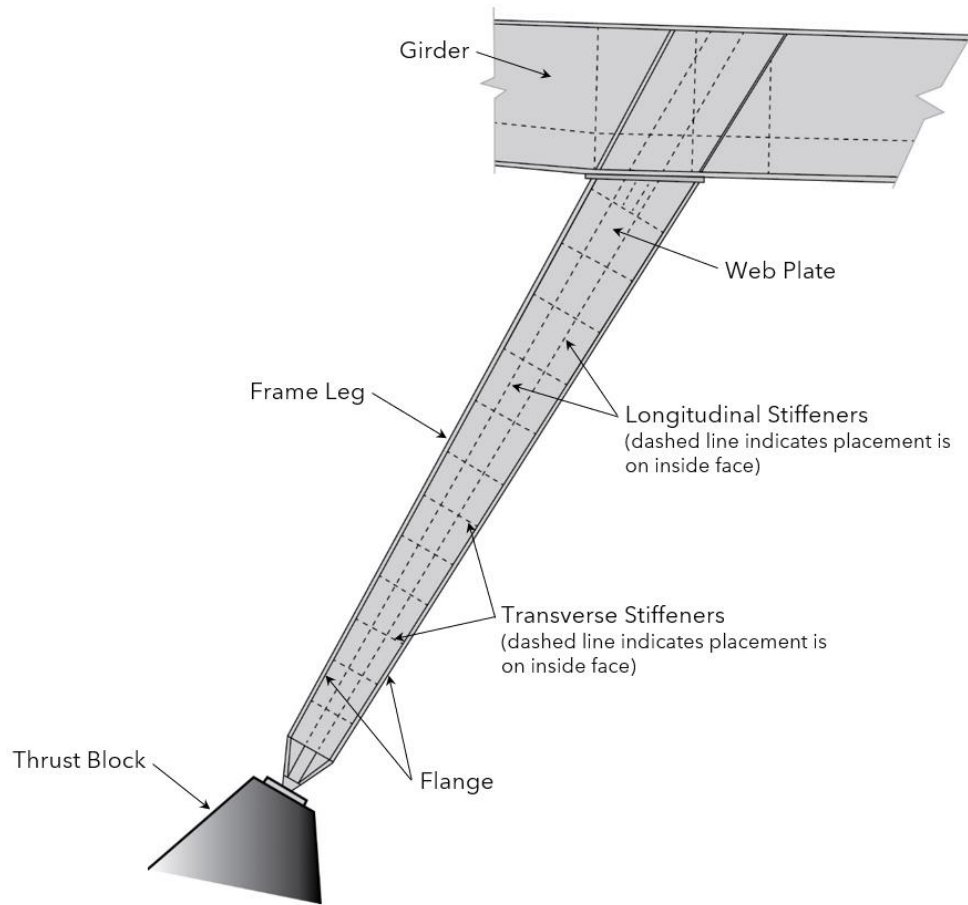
Elevation view of Fern Hollow Bridge leg and segment of main girder, shown from the outside. (Source: FHWA; modified by NTSB)
